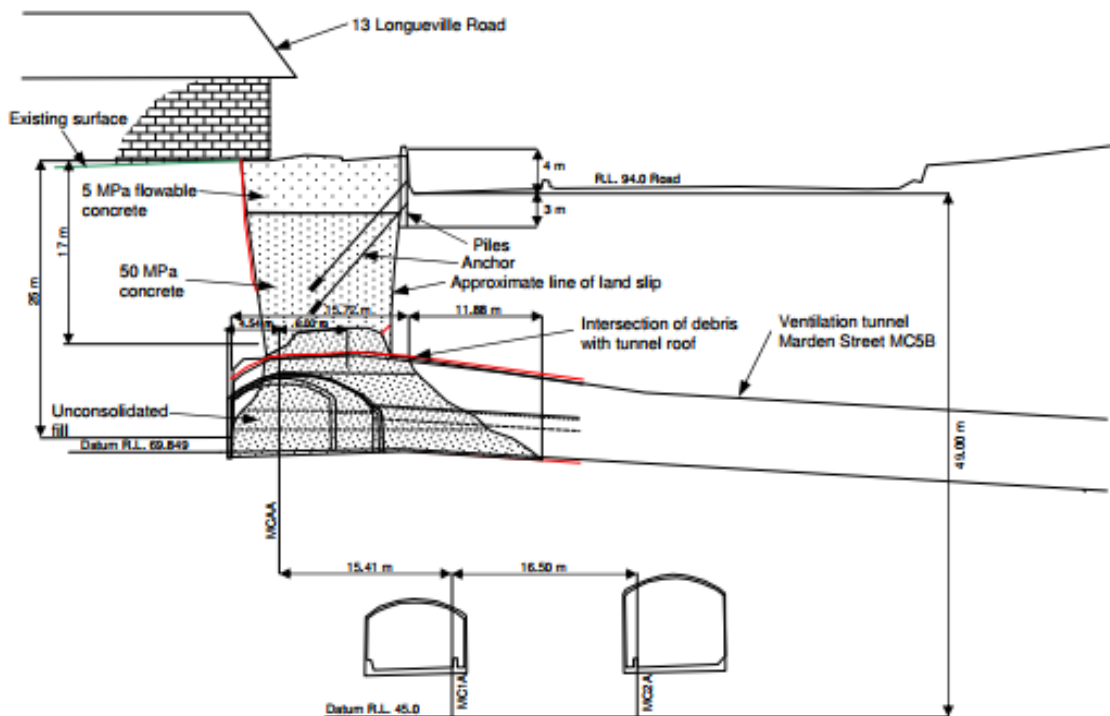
Vertical section through the collapse site following the concrete pours (Brown 2006)
